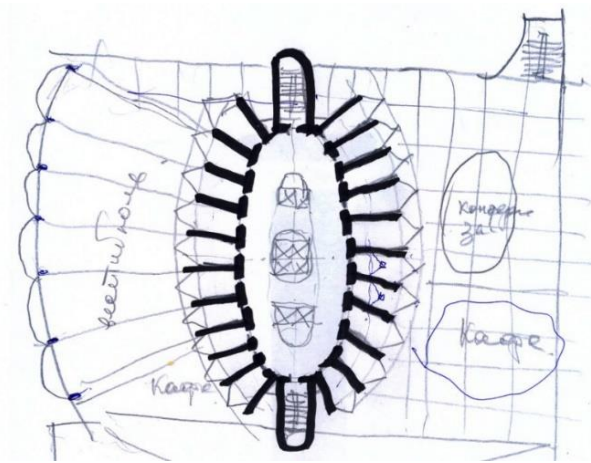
Kazakhstan Hotel Plan. Drawing by architect A. Anchugov
